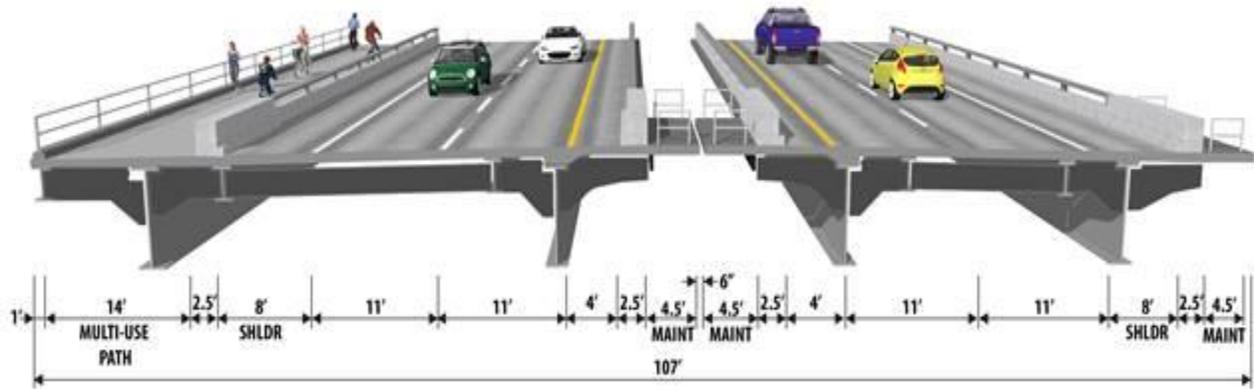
Build Alternative Typical Section – 65 ft. High-Level Fixed Bridge
